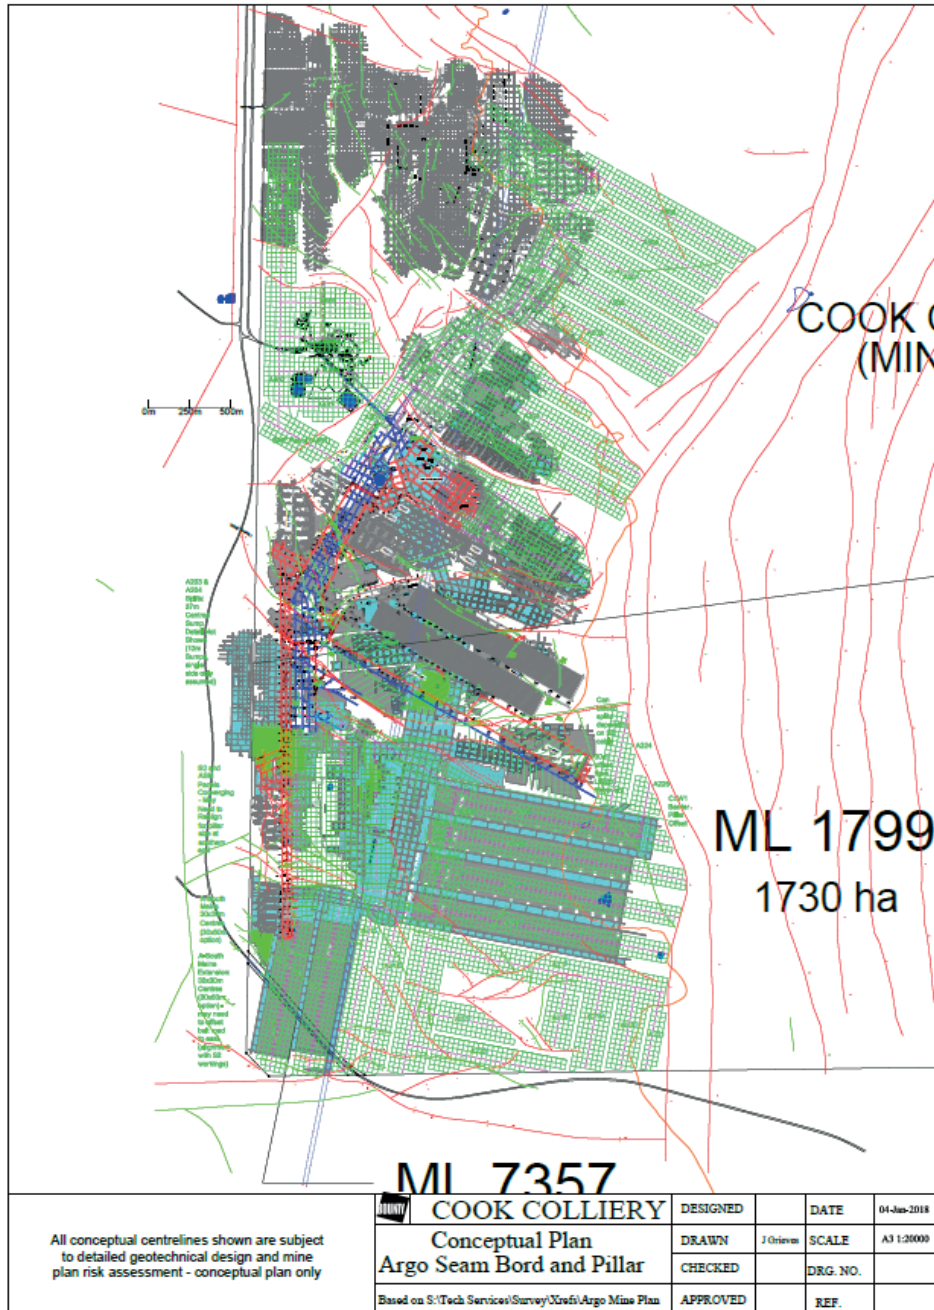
Preliminary Bord and Pillar Mine Layout
